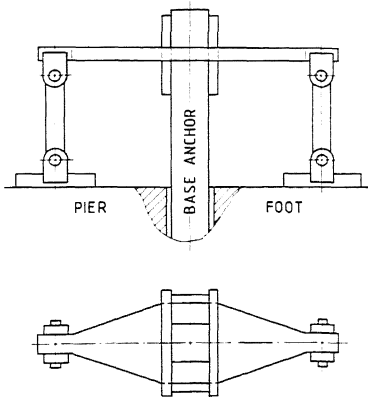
A simple form of damper which may be used for "stepping" structures; elevation and plan.
